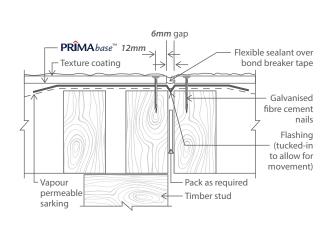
Vertical Movement Joints - Intersection with Clad Wall
